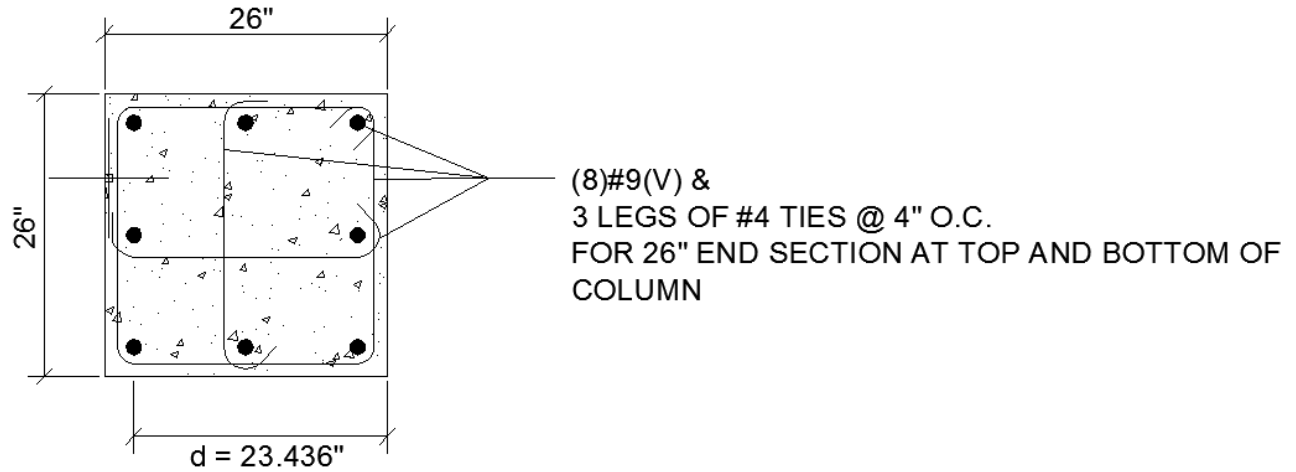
Exterior column, cross section at end of column at the 2nd floor level based on tsunami design requirements.
